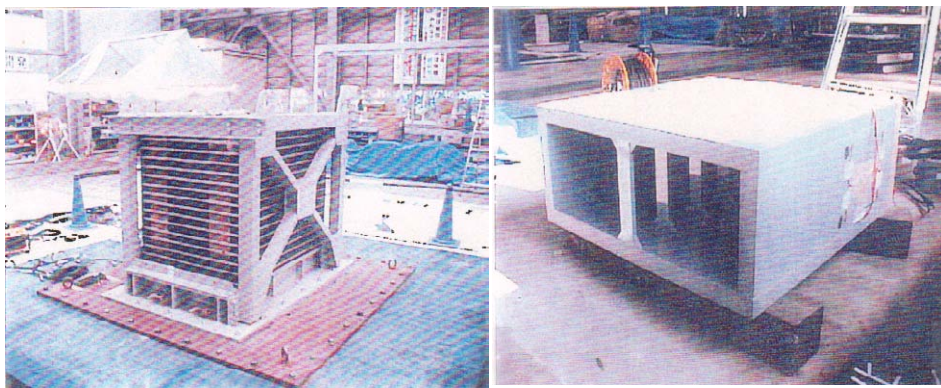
Soil container of shaking table tests Photo 2-2 Subway structure model of Daikai station
